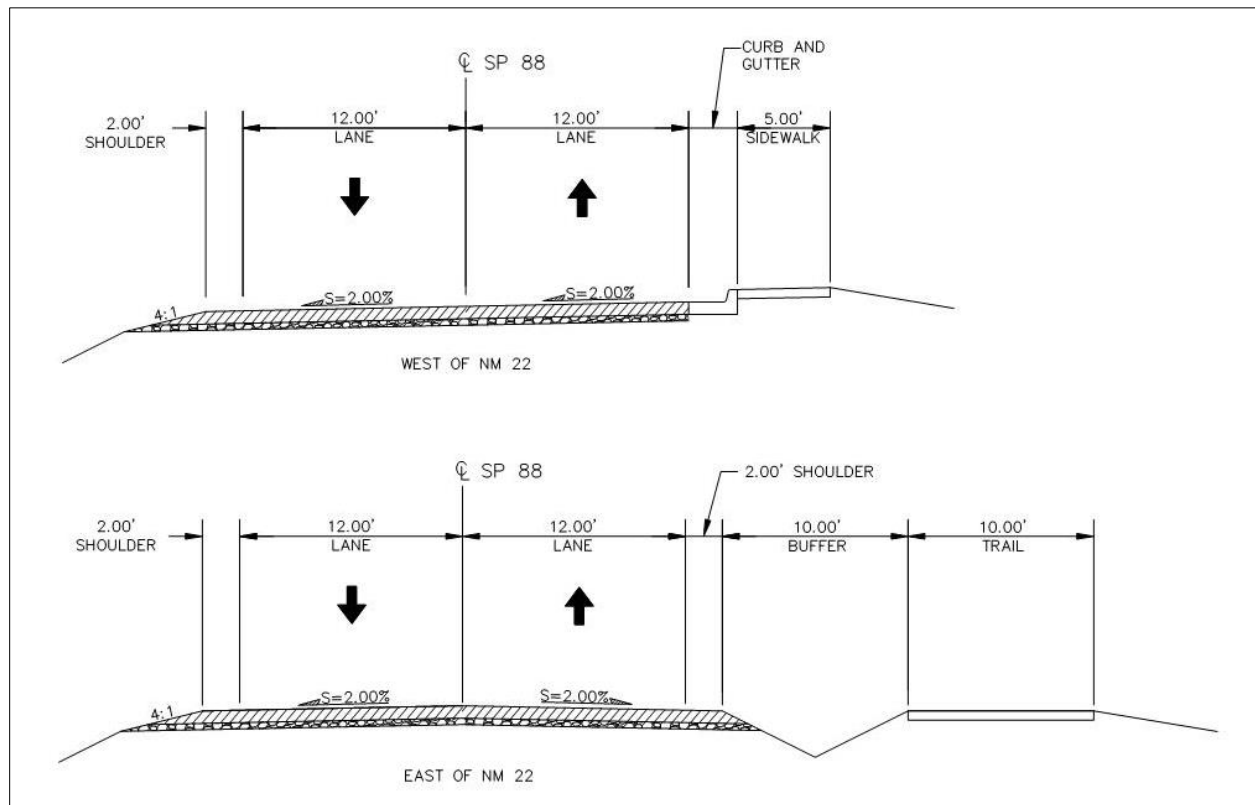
SP 88 Existing/Proposed Cross Sections, looking east
